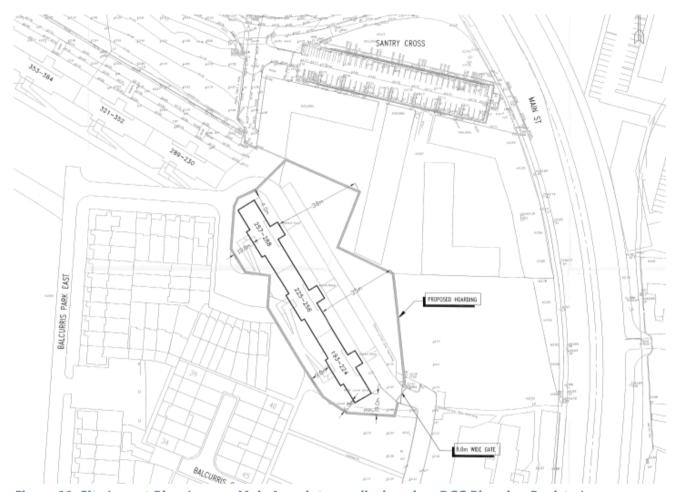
Site Layout Plan (source: Muir Associates as displayed on DCC Planning Register)
